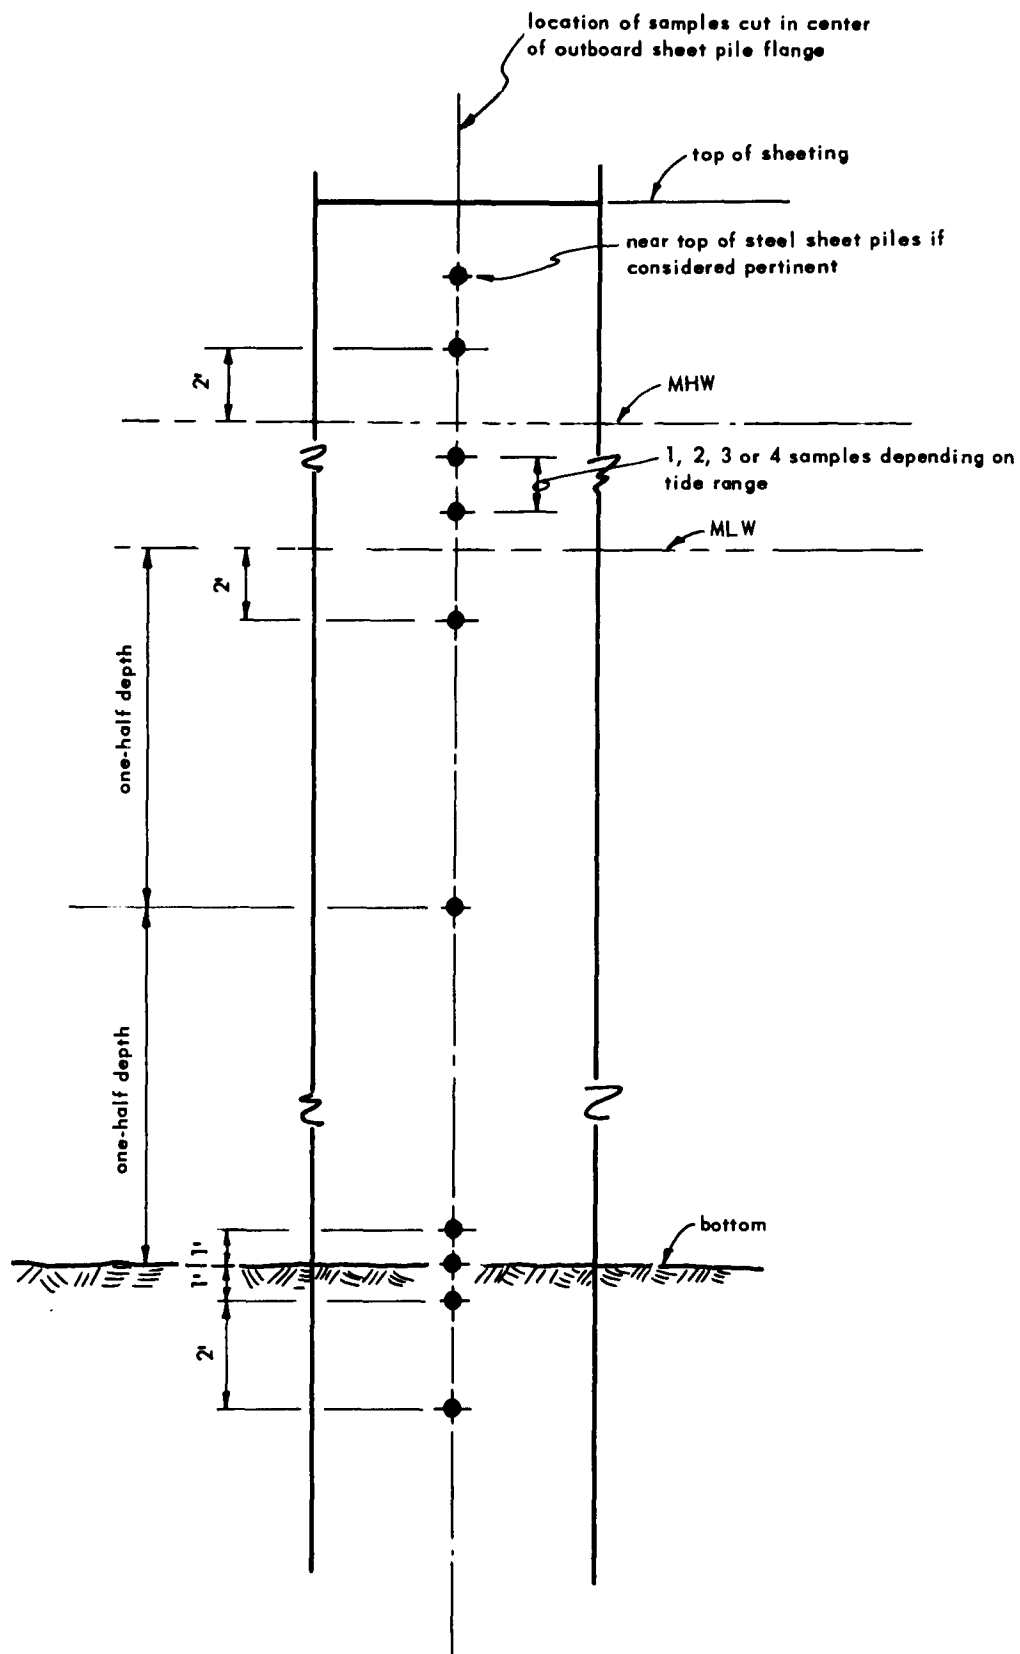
Location of samples cut to determine thickness of steel sheet piling.
